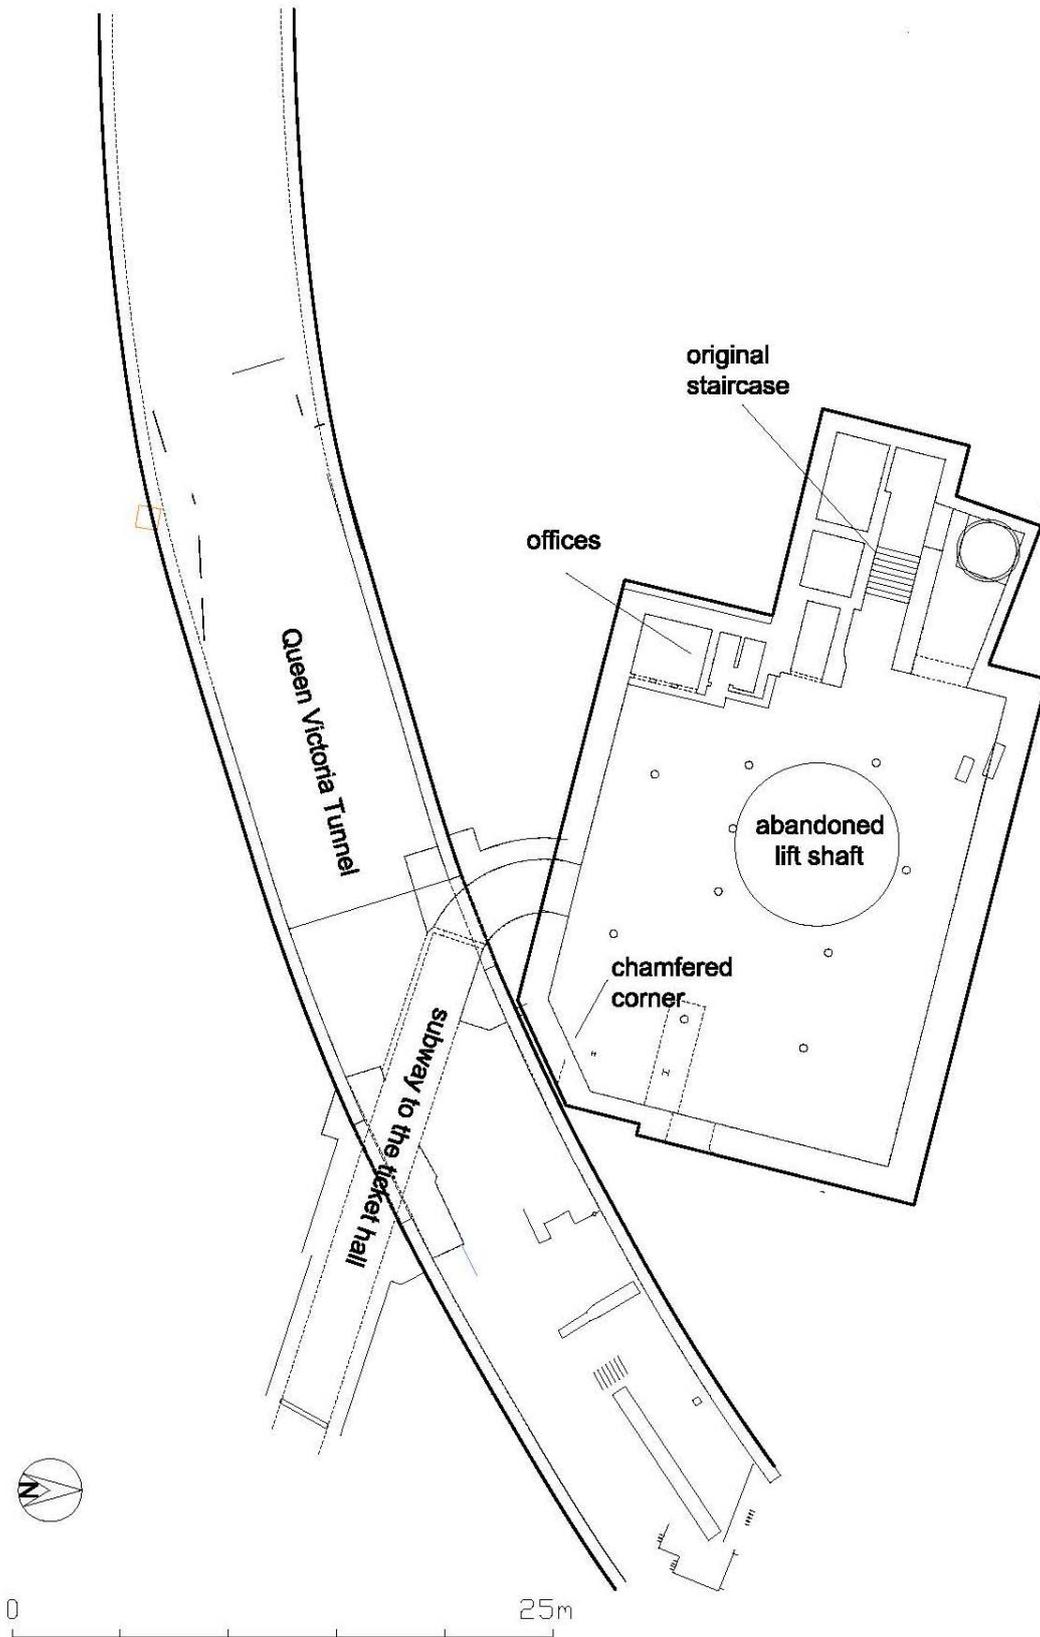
Plan of the Broad Street Ticket Hall and Queen Victoria Tunnel
